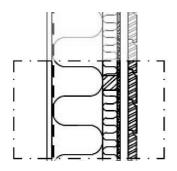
Structural section of timber frame external wall. The structure consists of interior materials (gypsum board or chipboard approx. 10 mm), vapour barrier, frame and thermal insulation (approx. 150-200 mm), wind shield board (approx. 10-20 mm) and external surface material. This structure also corresponds approximately to external walls in modern timber buildings and was from the 1940s, but with small variations (Weijo et al. 2019).
